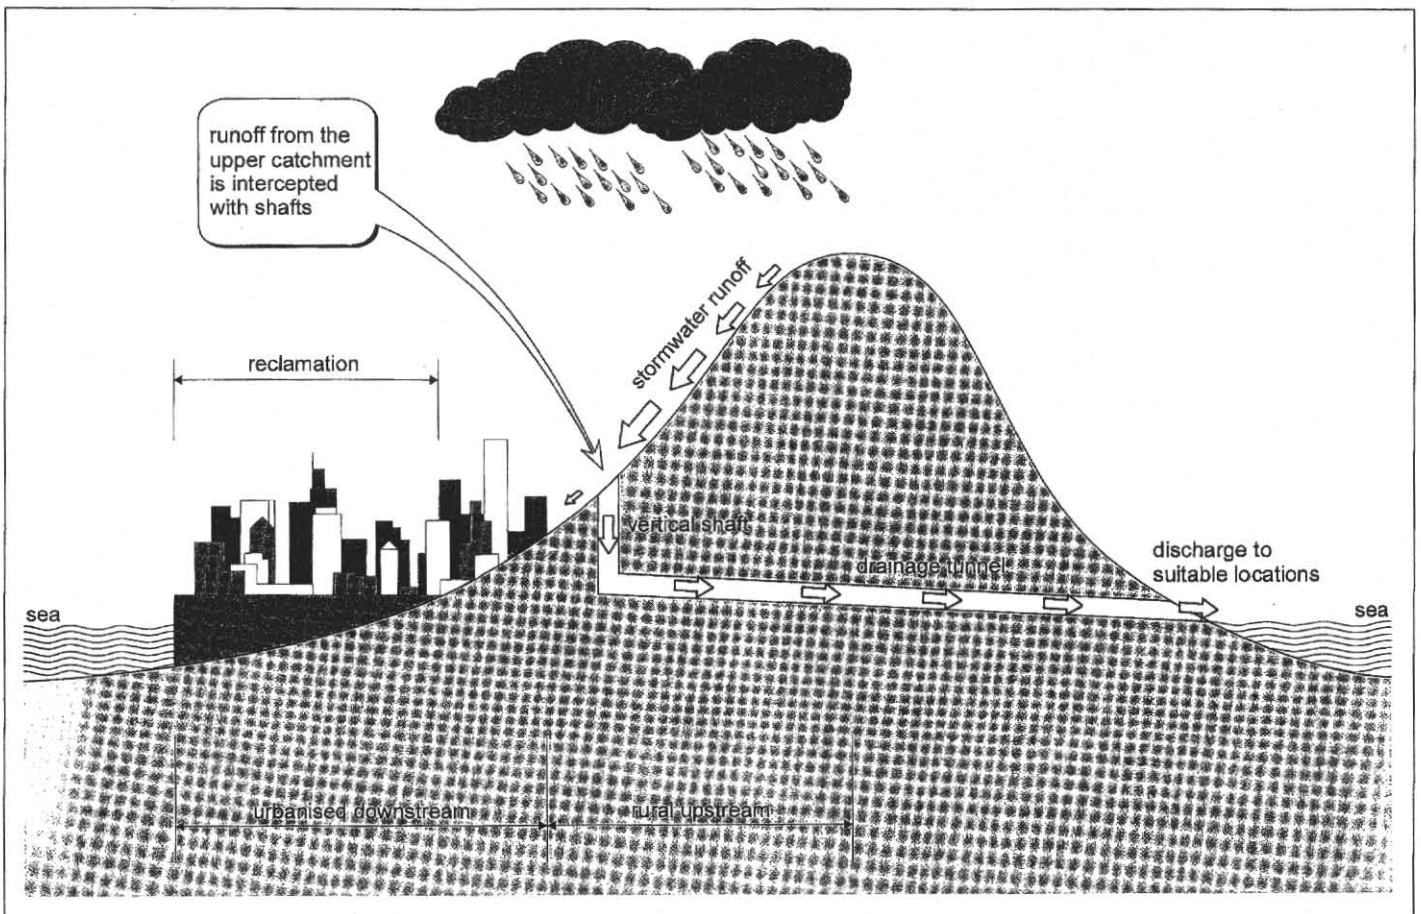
Schematic Layout of Drainage Tunnel Approach
